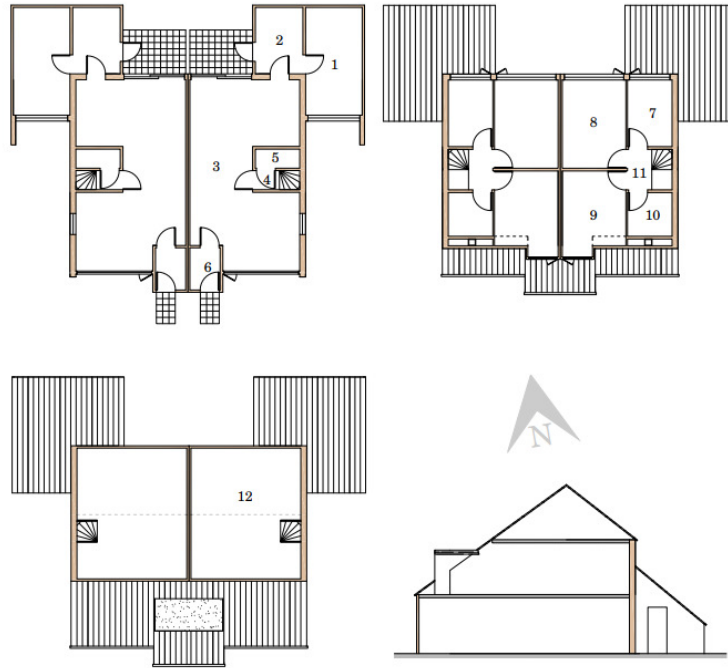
architectural plans. From top to bottom and left to right: ground, first and attic front views and building lateral view. The drawing scale is 1:42.
